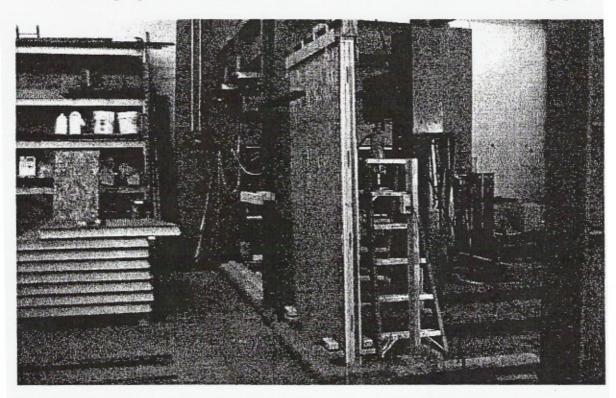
Test Setup for Compressive Loading on 8' OSB-OSB Panel
